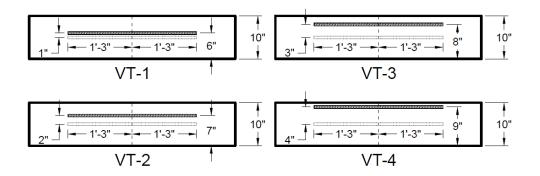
Section Views of the Vertical Translation Misalignment Specimens
